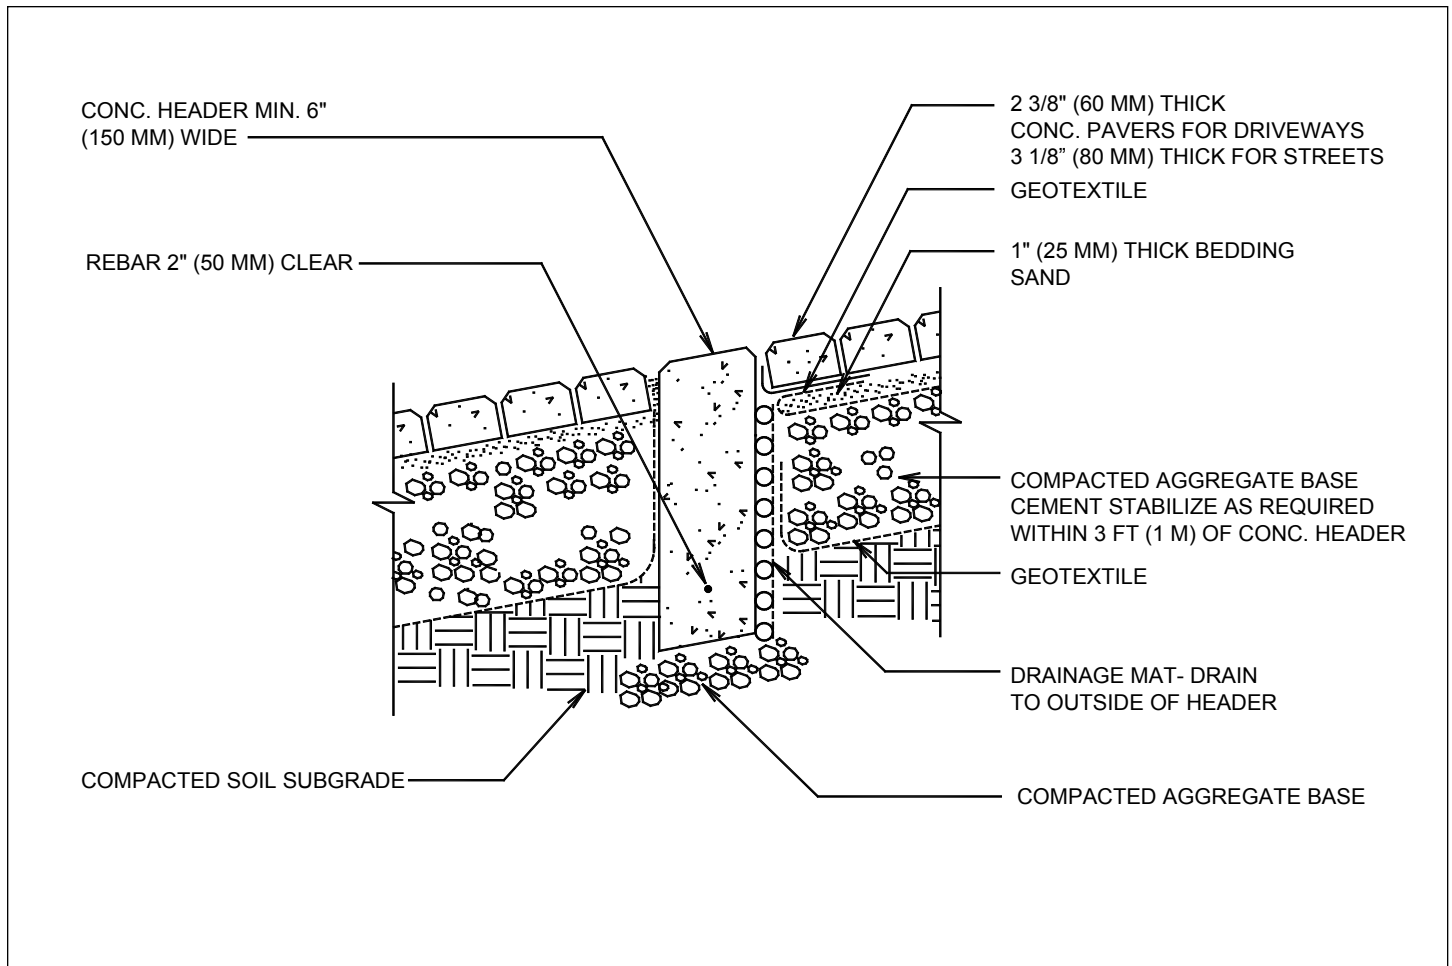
One way to remove water at the base of the installation is by placing drainage mat vertically against the concrete header curb. Note the location of geotextile to prevent loss of bedding sand.
